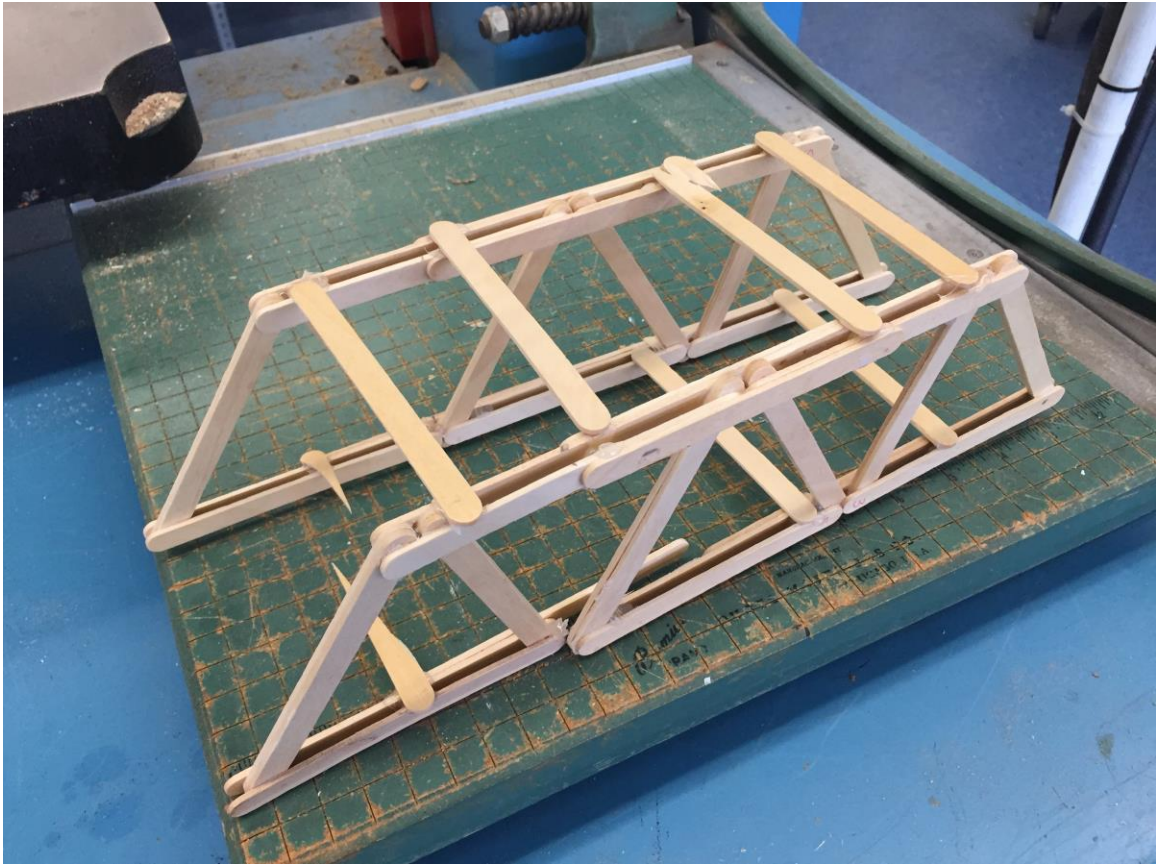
Warren Truss Bridge Prototype Failure after Load Testing
